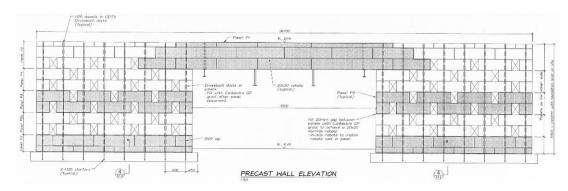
Architectural Precast Wall – Screw Pile Locations
